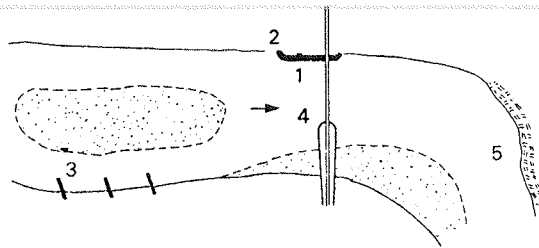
Sketch plan showing scour-susceptible locations alongside banks and training works: 1, parallel flow along bank; 2, nose of guide bank; 3, nose of spur; 4, projecting embankment end slope; 5, below a bank subject to direct impingement.
